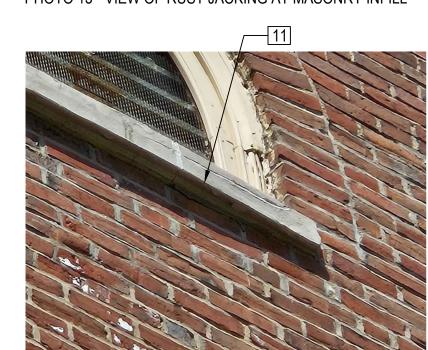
VIEW OF WINDOW SILL AT HALF-ROUND
